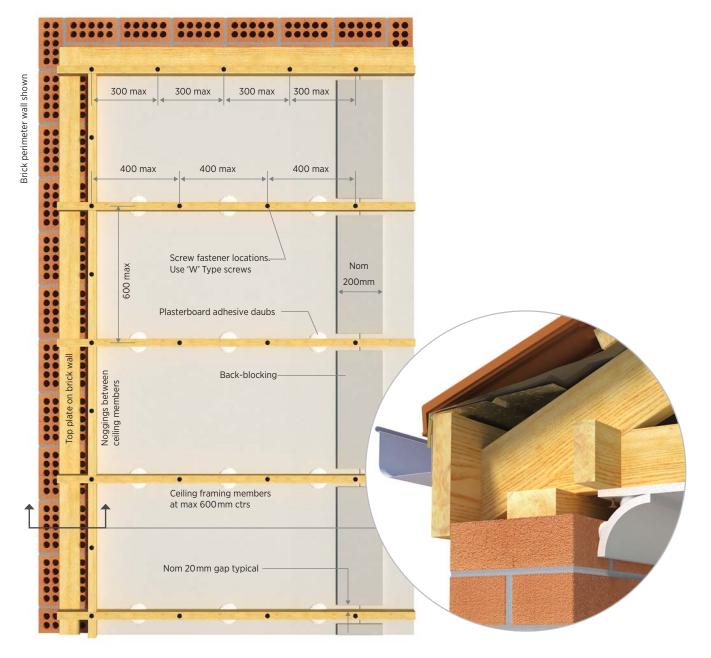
Garage ceiling fixing layout (1200mm wide plasterboard sheets shown)
